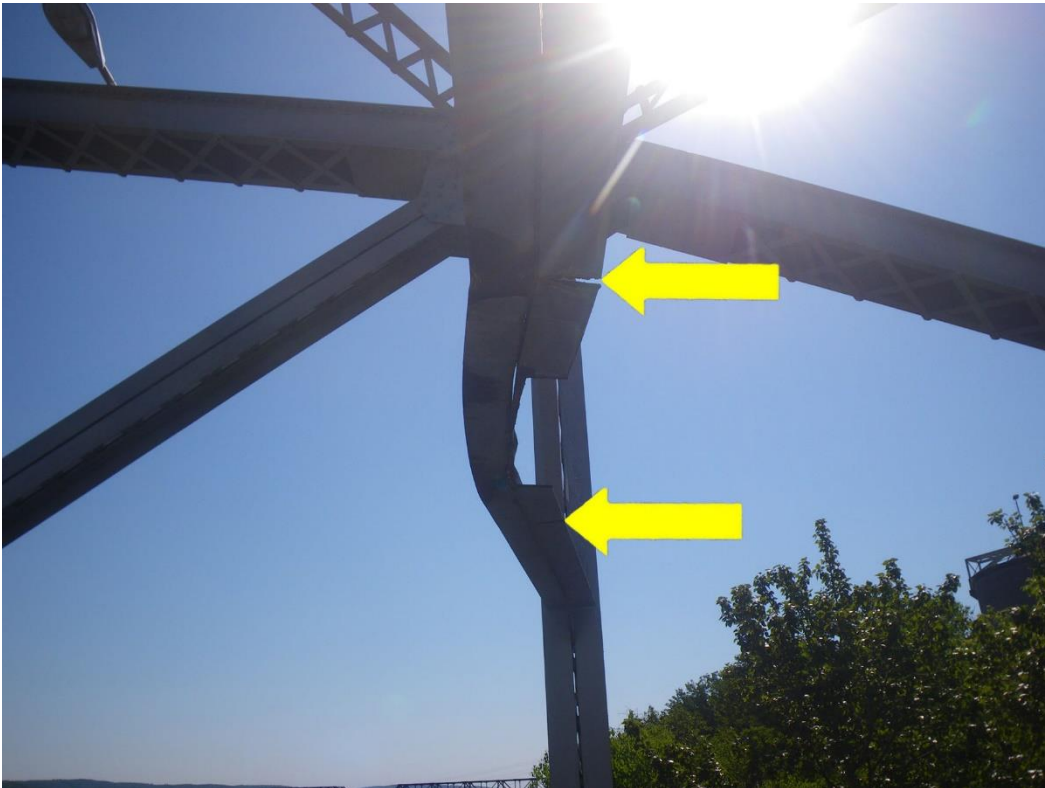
Sway Bracing Lower Horizontal Strut above Northbound Lane, Panel Point 2S, Span 4, Looking East - Flange angles with sweep, separation between back to back vertical legs, tear and cut out portion the outstanding leg due to collision damage.
